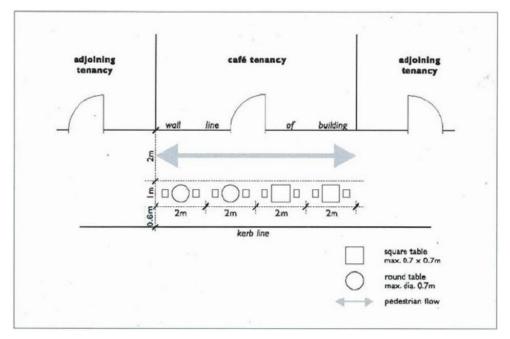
Example of a seating layout for a standard footpath. Chairs are sited so as not to intrude on the 2m wide pedestrian corridor.
